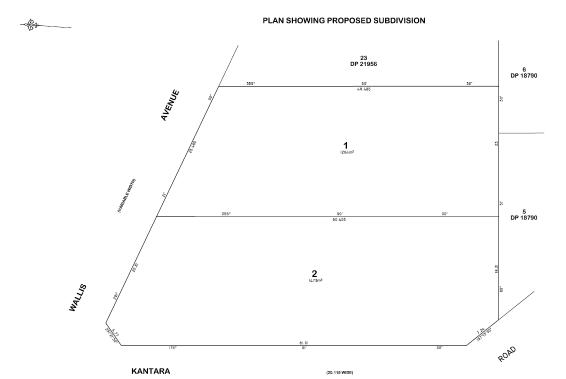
Plan of Proposed subdivision – Lot 1  $1264m^2$  - Lot  $21473m^2$
